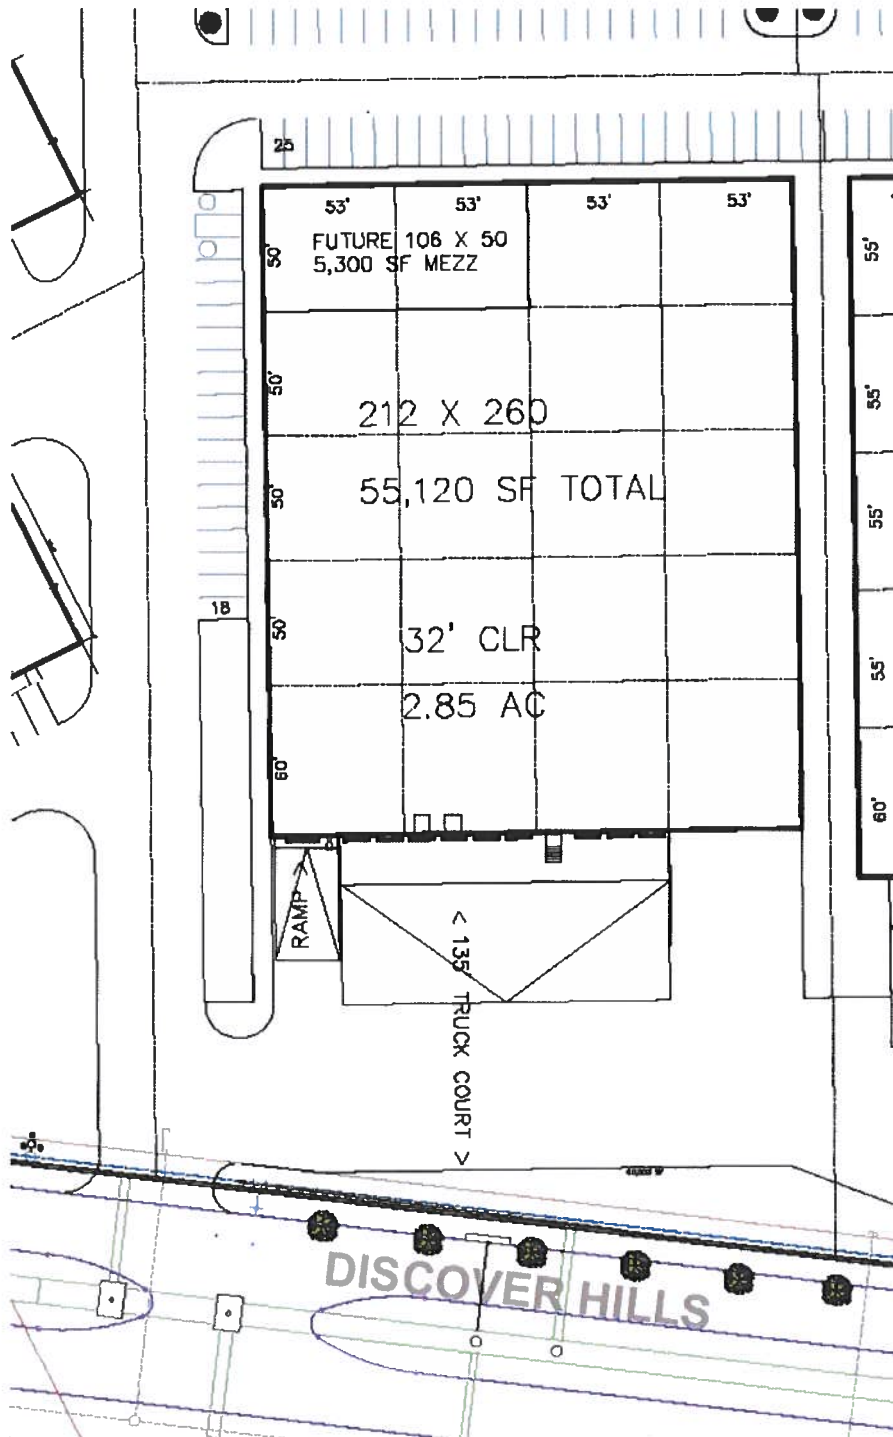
## EXHIBIT A - SUPPORT DOCUMENTATION FOR REINVESTMENT ZONE OR SITE PLAN
